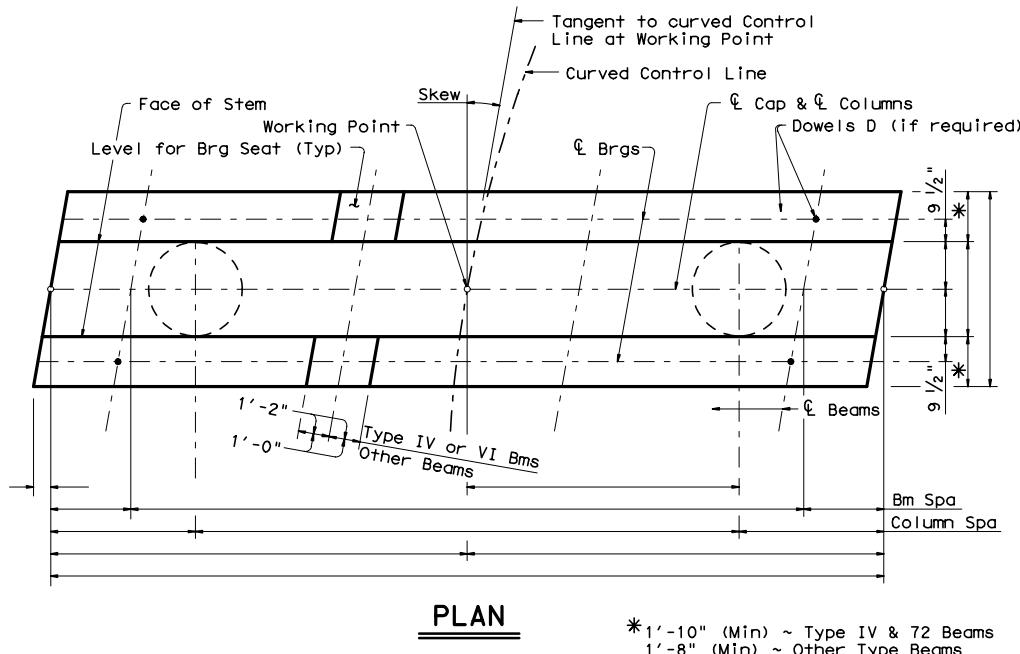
Plan View Example. Online users can click 4-7 to view this illustration in PDF.
